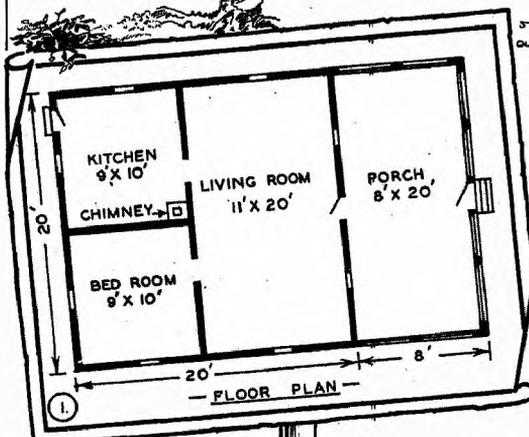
shows floor plan of the cabin which can be changed to suit builder. The 2"x6" floor joists in Figs. 2 and 3 rest on a 6" square beam running down the center of the floor plan. It is advisable to use concrete piers under the beam also. The sunburst effect in Fig. 4 is an attractive feature, yet provides a sturdy support for the roof.
